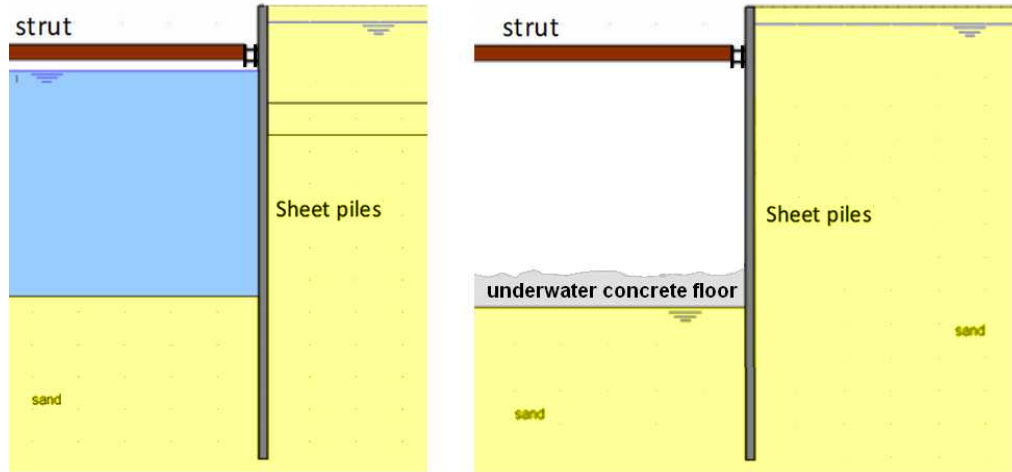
Two potentially governing load cases for sheetpile wall stability
